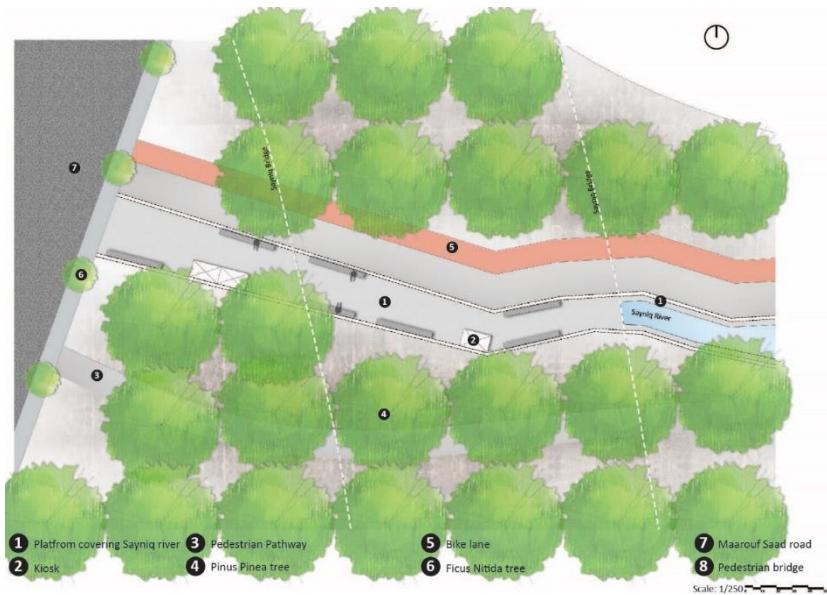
Sayniq Motorway Garden, Site 5, Plan. Source: Author
